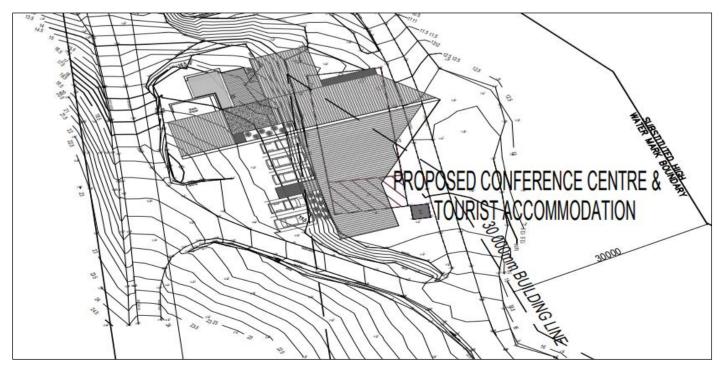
Proposed Conference Centre and Tourist Facilities (TMBA, 2023)
